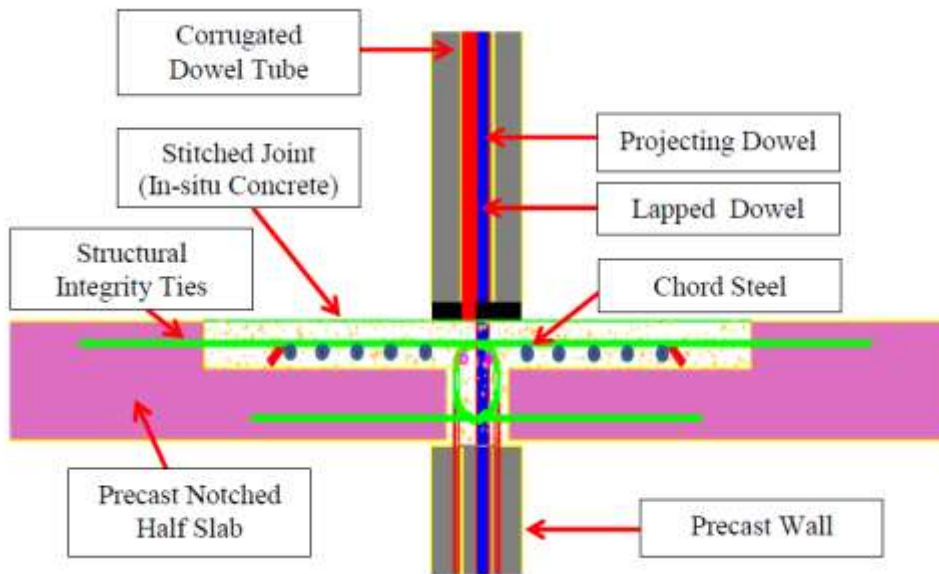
Pragati Towers–Typical Wall-to-Wall Dowel & Wall-to-Slab“Stitched”Joint Connection
